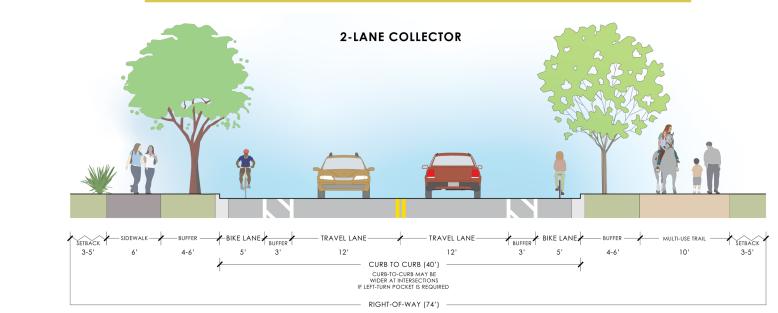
Typical Cross-Sections of Designated 2-Lane Collector Roadways, Part 4
